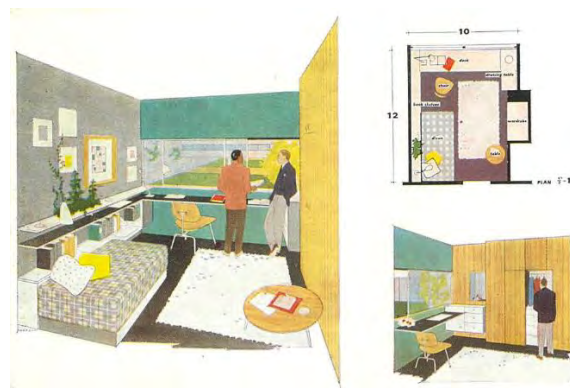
Proposed floor plan and internal design of a student studio, 1950s. (Source: International House Archives, University of Melbourne)
